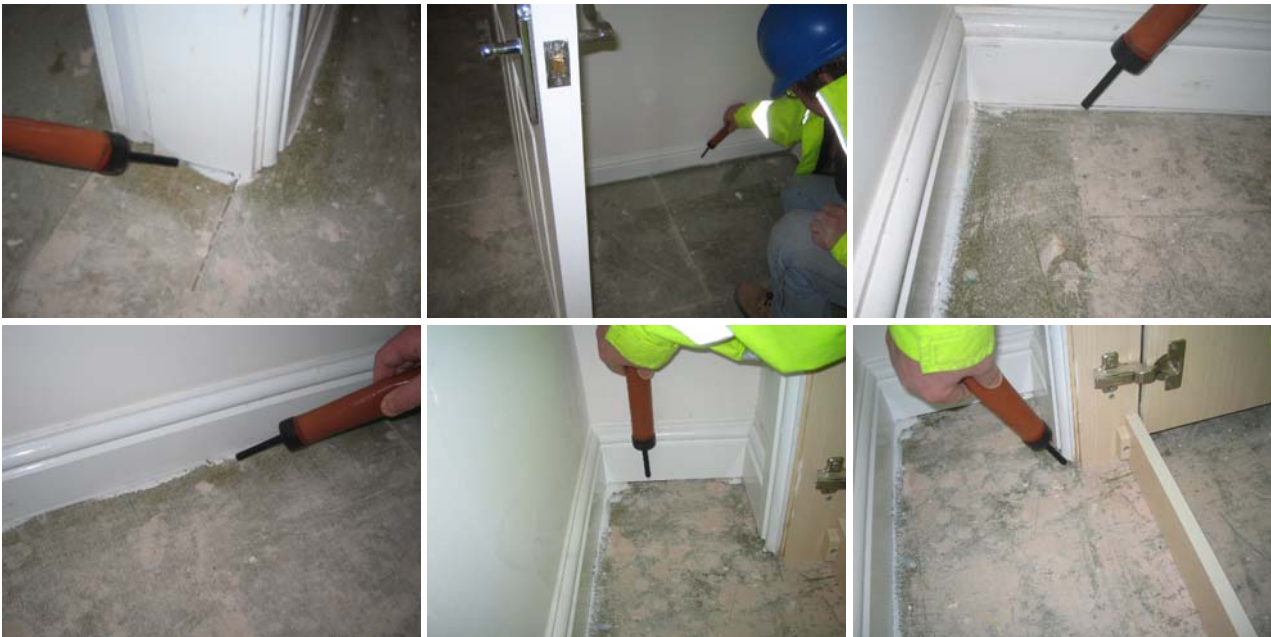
Missing or failed sealing at the wall/floor junctions in the landing, lounge, master bedroom and built-in wardrobe on the first floor.
